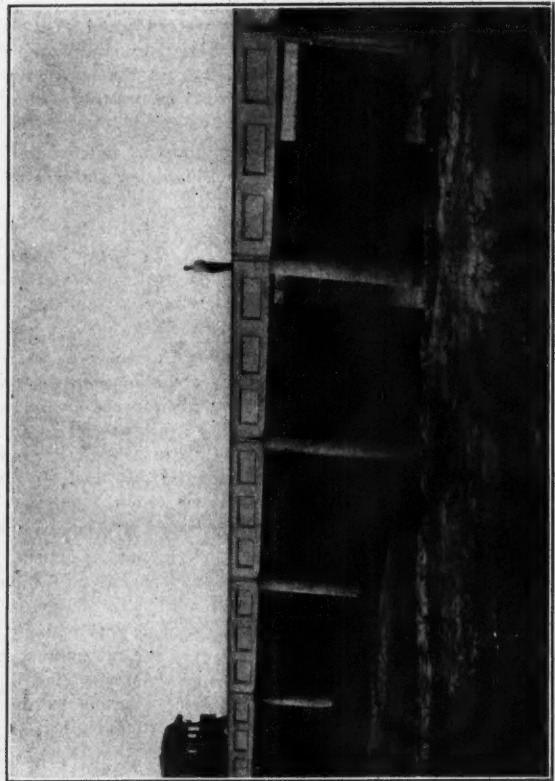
C., B. & Q. R. R. Concrete Pier Trestle.
